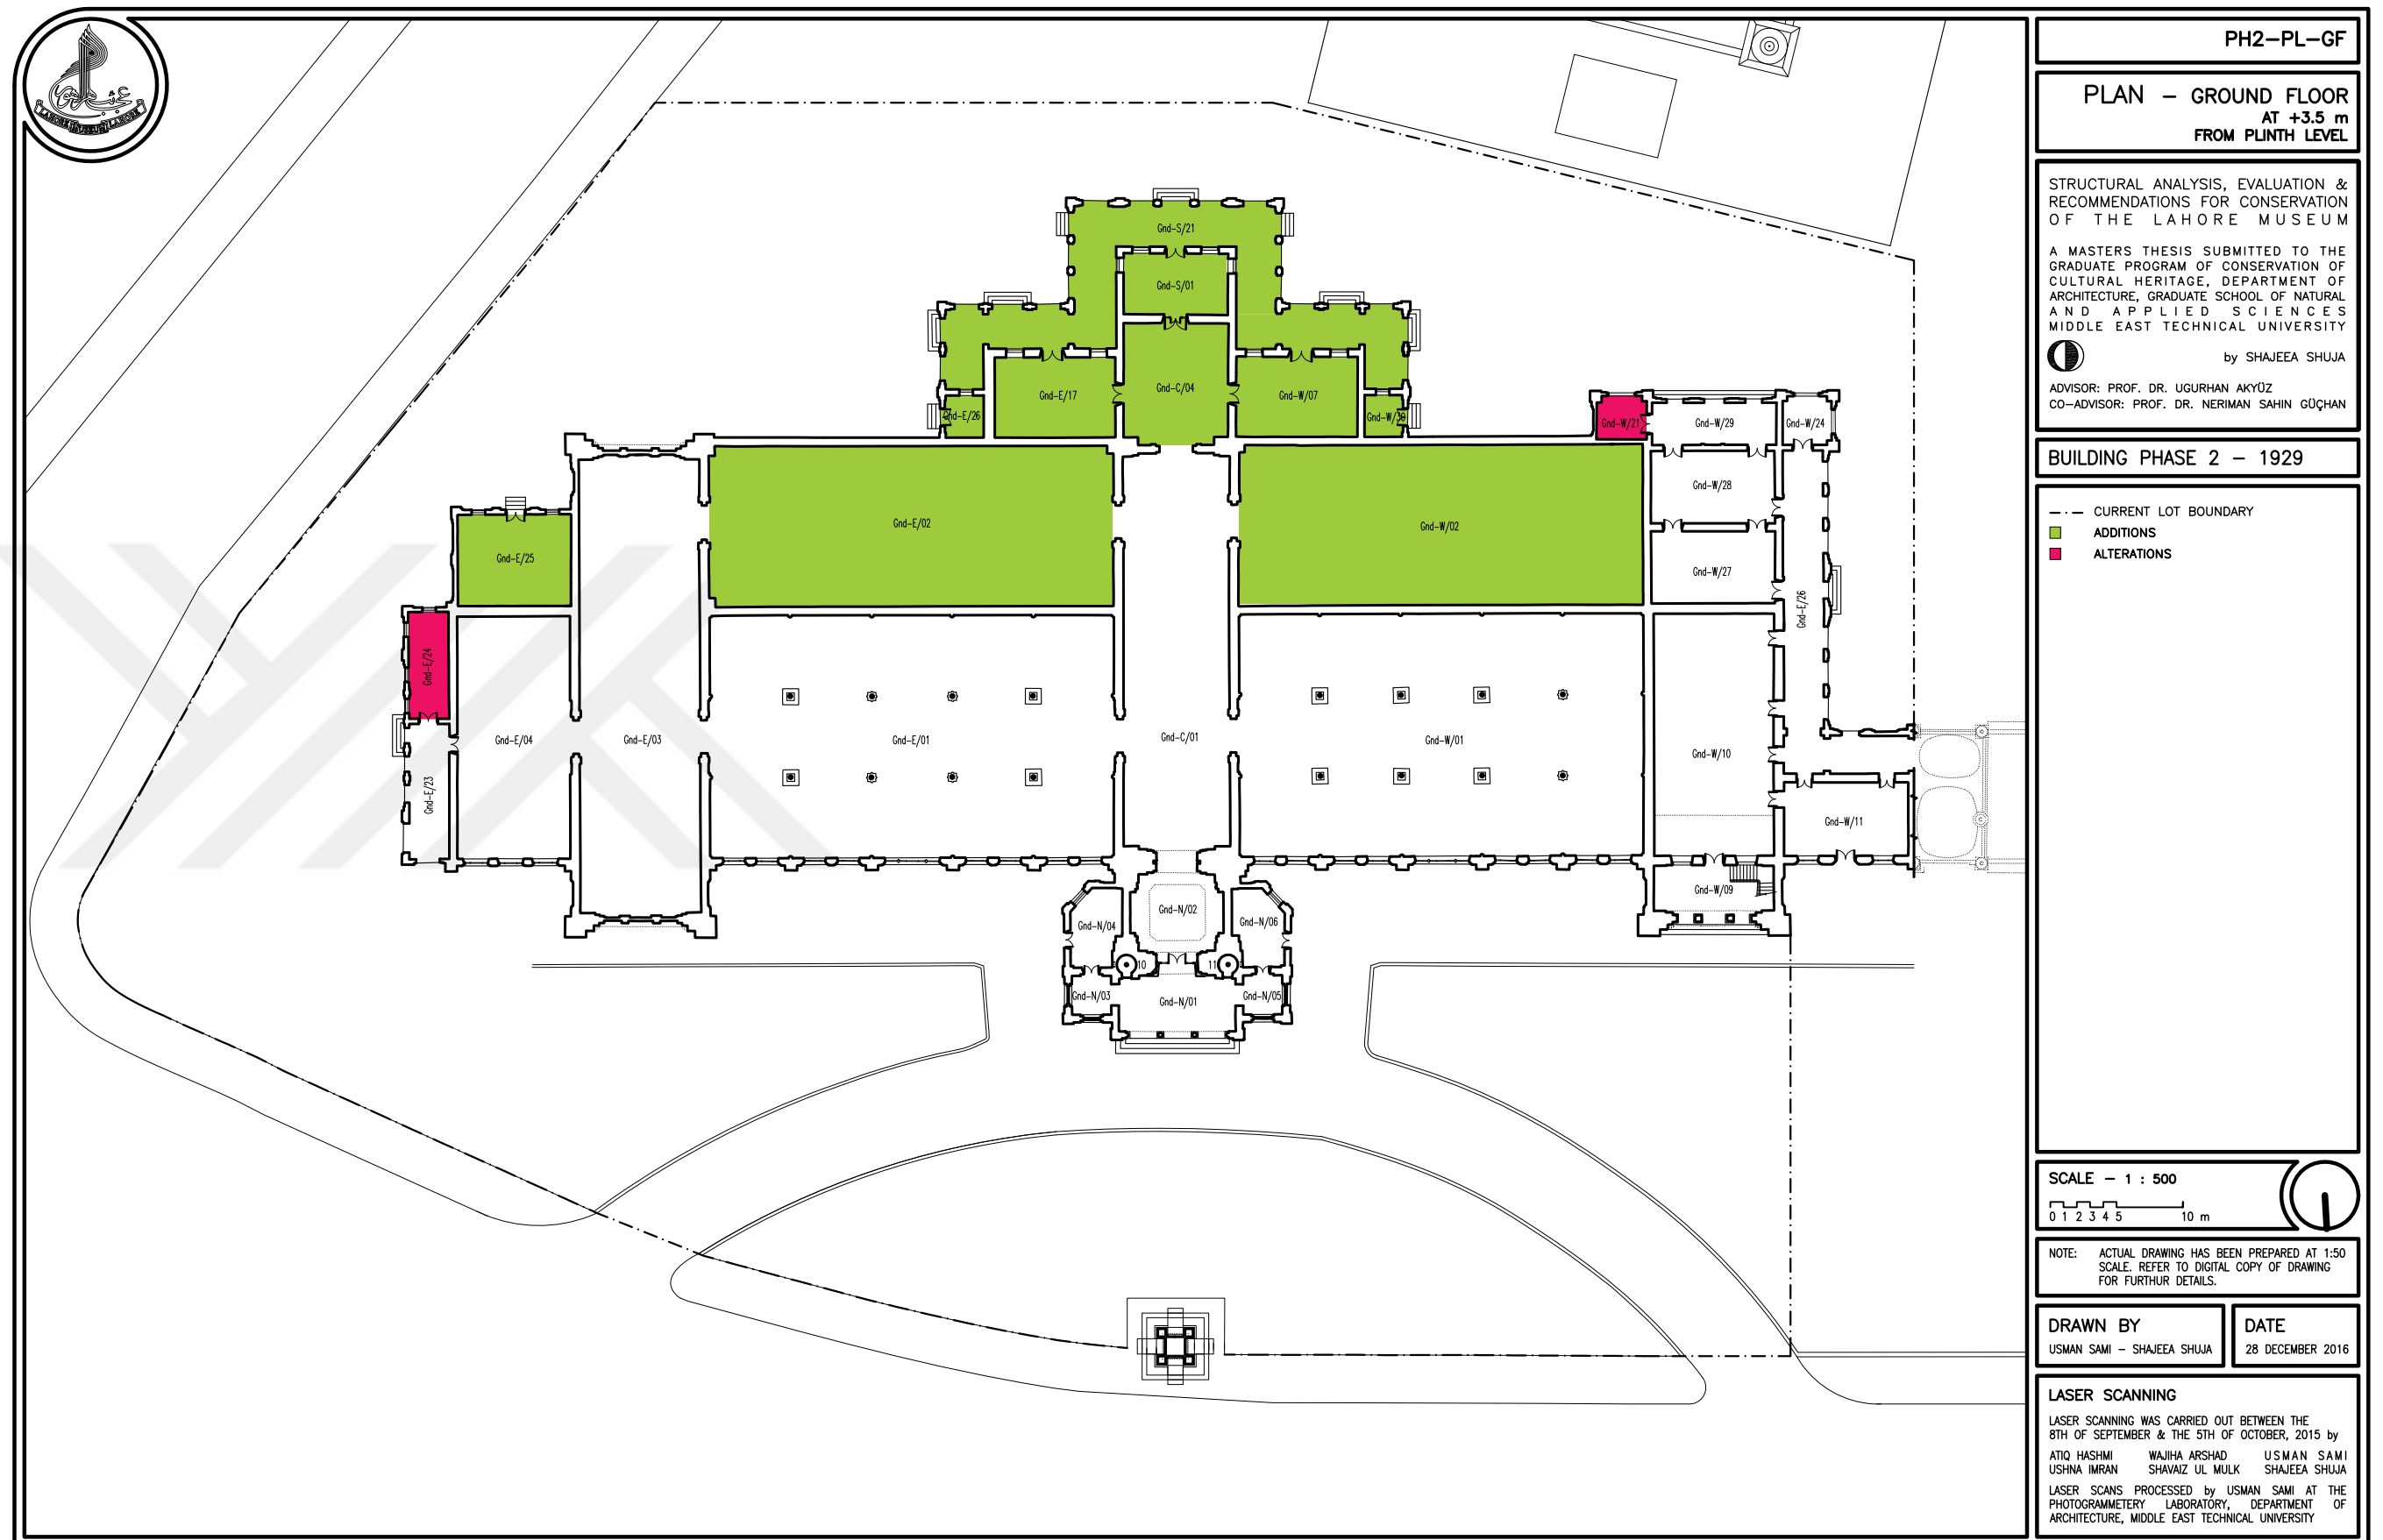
PH2-PL-GF – Building Phase 2 – 1929 Plan – Ground Floor (2016)
